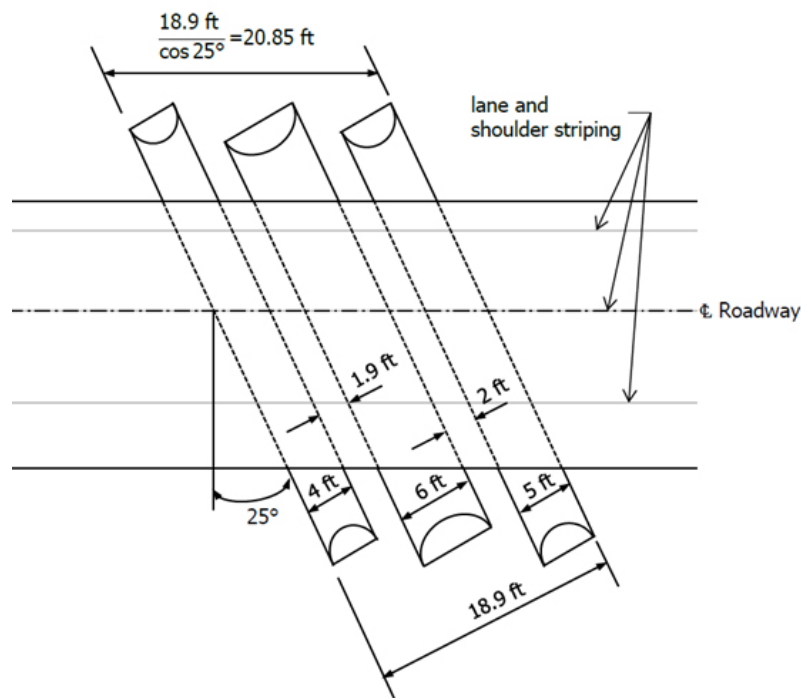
Example Plan View of a Skewed, Multi-Pipe Culvert Under Fill
